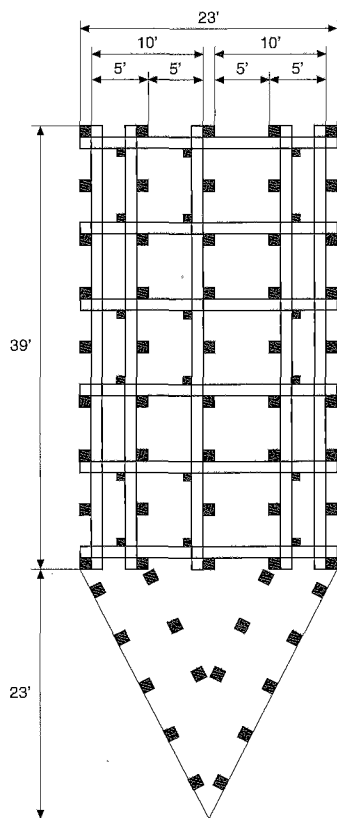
Reconstructed pile-driving plan of pile group 2000 with framework and cofferdam.
